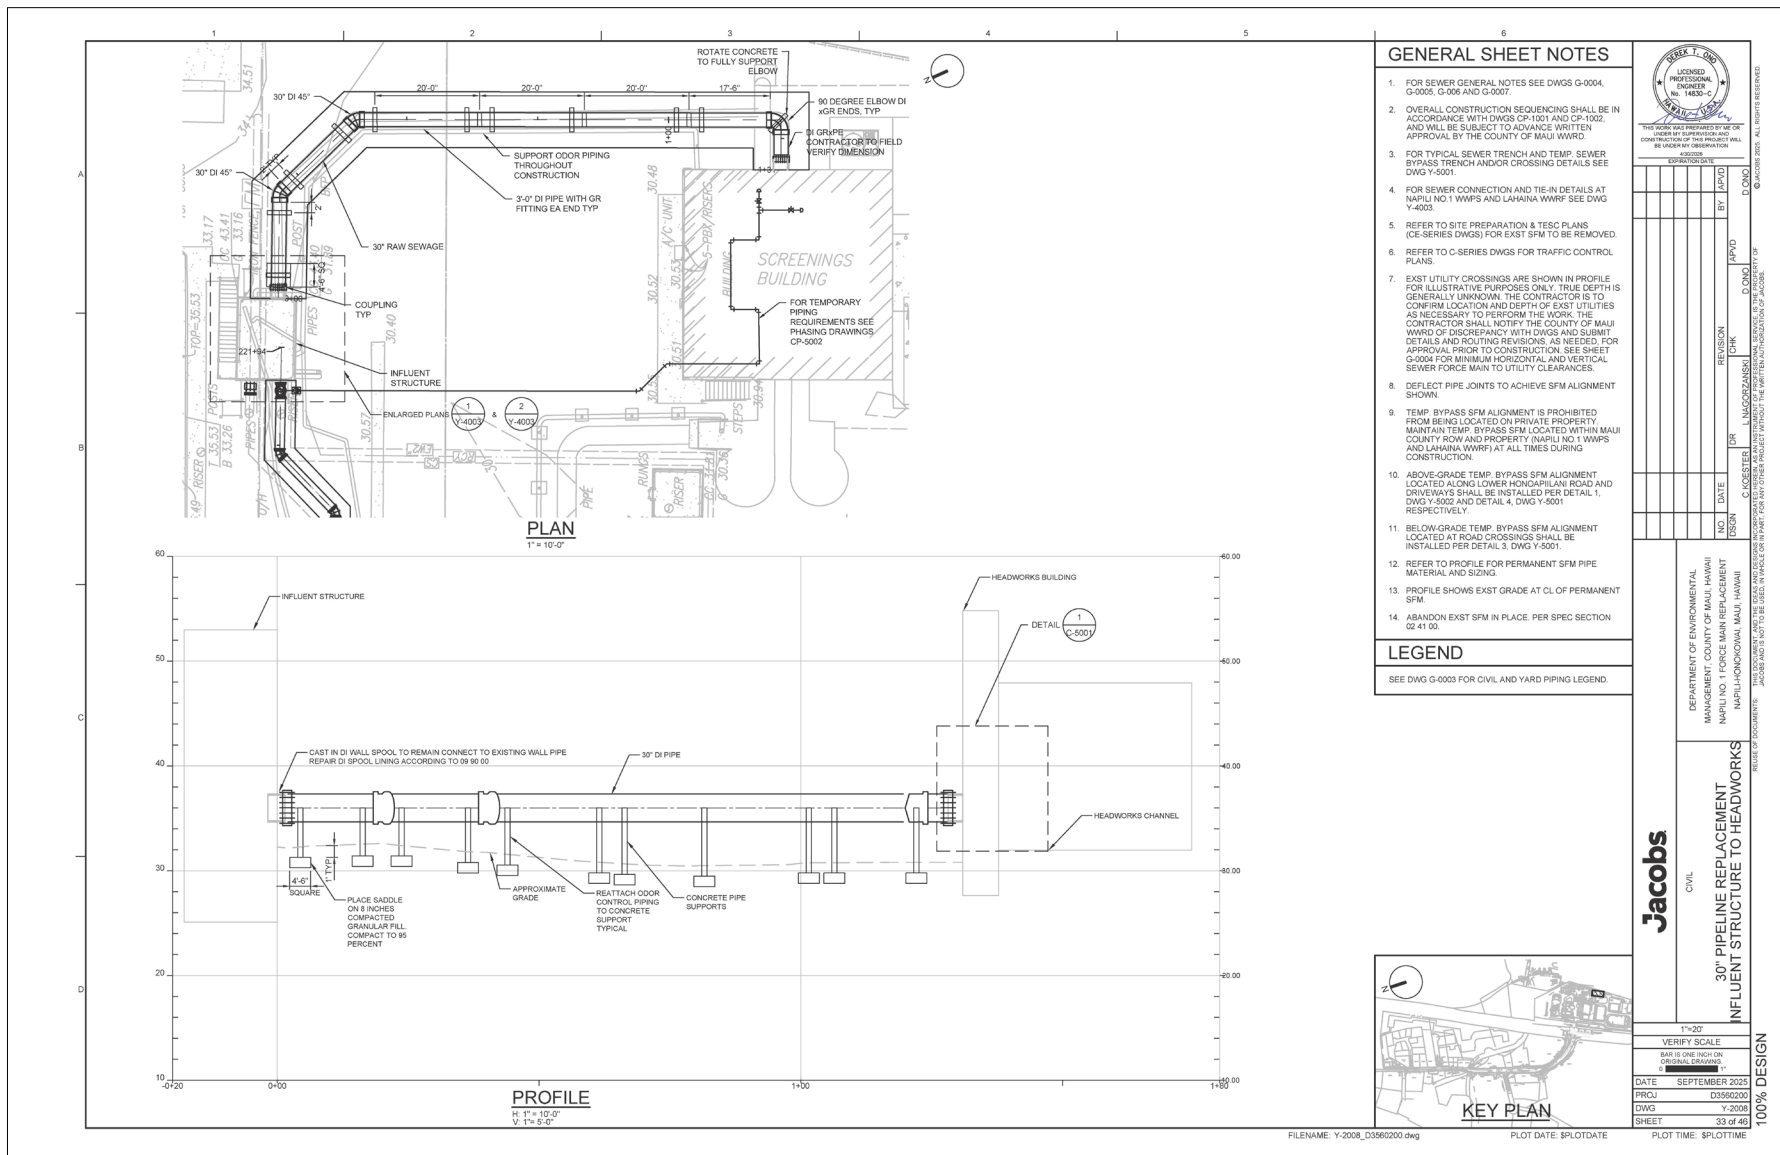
Site plan and profile for the 30-inch above-grade pipe installation.
